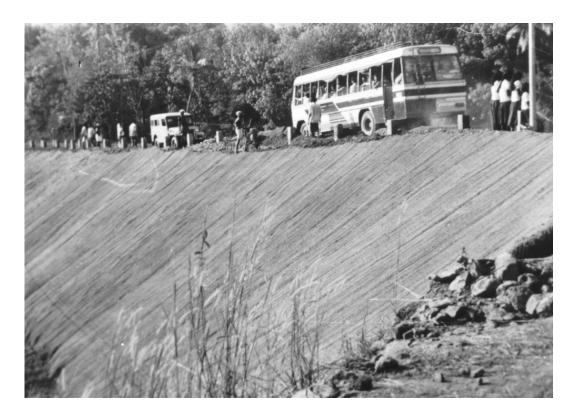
(a). Laying of coir geotextile at the road slope at Moovattupuzha.
